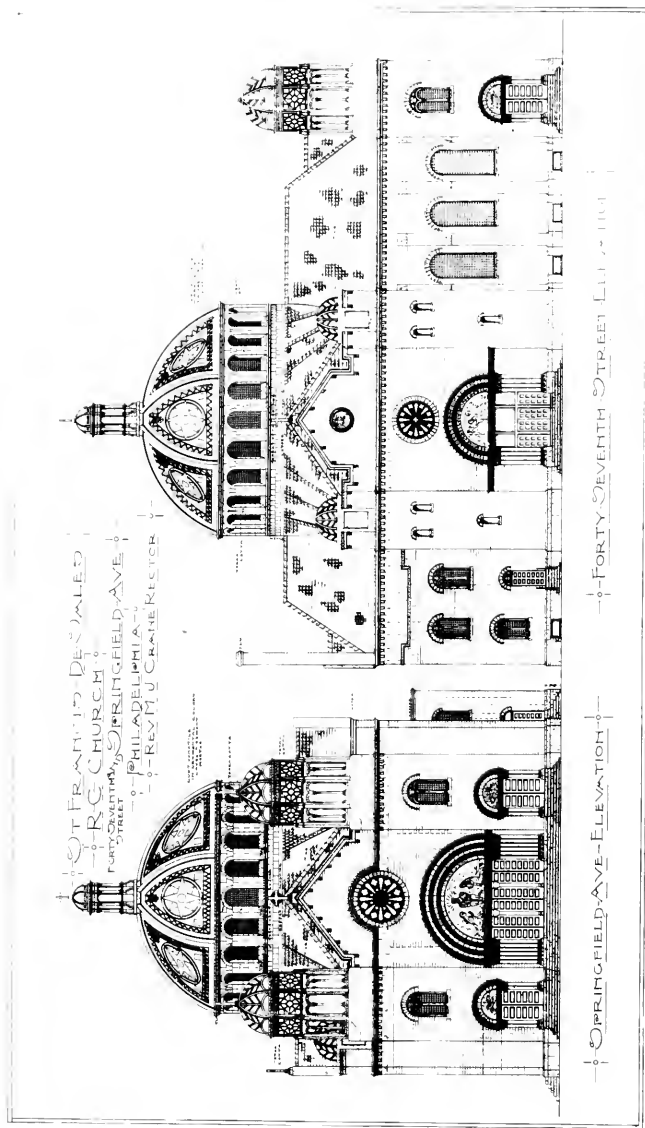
St. Francis de Sales Church: Preliminary Designs for the Street Elevations [Henry Dagitt Collection, Architectural Archives, The Athenaeum of Philadelphia.]
